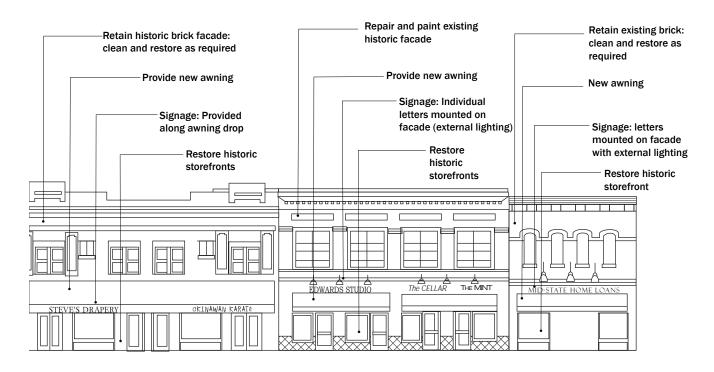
Downtown Retail North: Façade Renovation Guidelines
